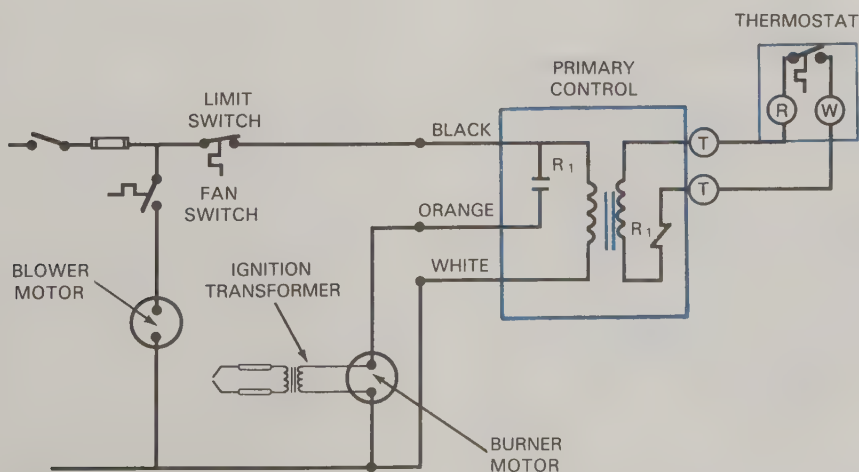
The relay (R_1) controls power supplied to the ignition transformer and burner motor.
